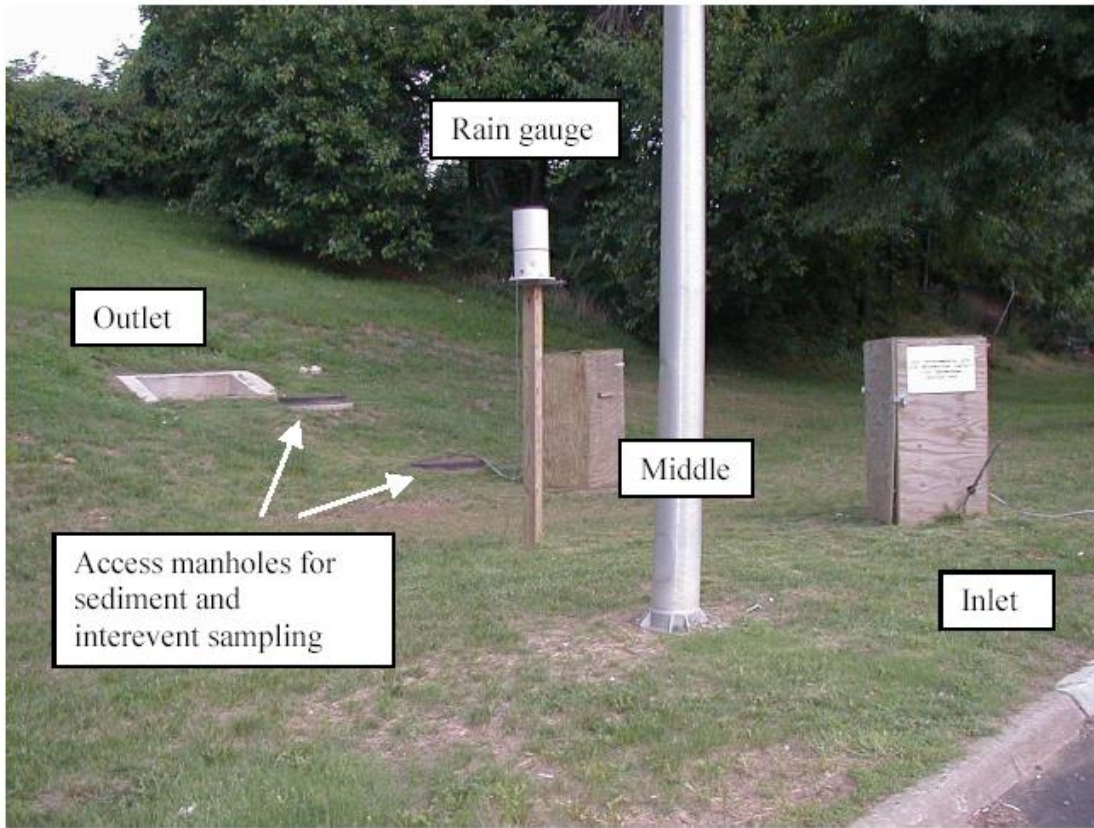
Site Monitoring Equipment: Plywood Boxes Protect Equipment (from Yu and Fassman, 2001).
